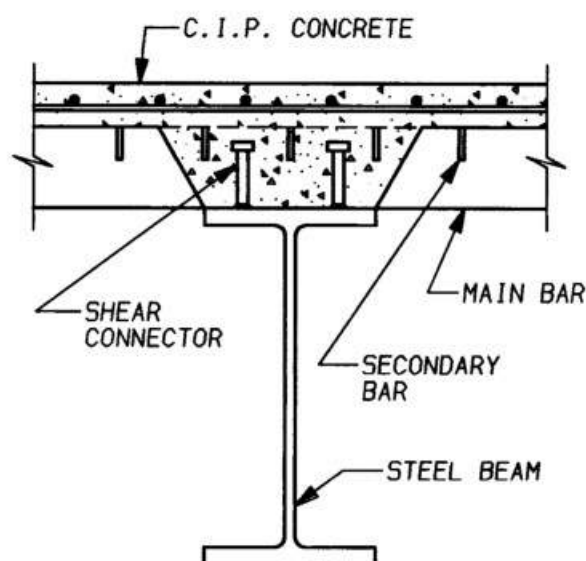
An Acceptable Shear Connection of Unfilled Grid Decks Composite with Reinforced Concrete Slabs to Beams
